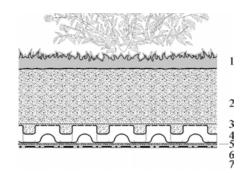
Inverted green roof system by ZinCo (Germany): layers: 1- plants; 2 - substrate; 3 - thermally strengthened filter sheet of SF; 4 - drainage and water retention element Floradrain FD 40; 5 - fibre mat ISM 50; 6 - protection and anti-slip mat Elastosave ES 30;7 - bearing base with water barrier and heat insulation (ZinCo, official site: http://www.zinco-usa.com)
